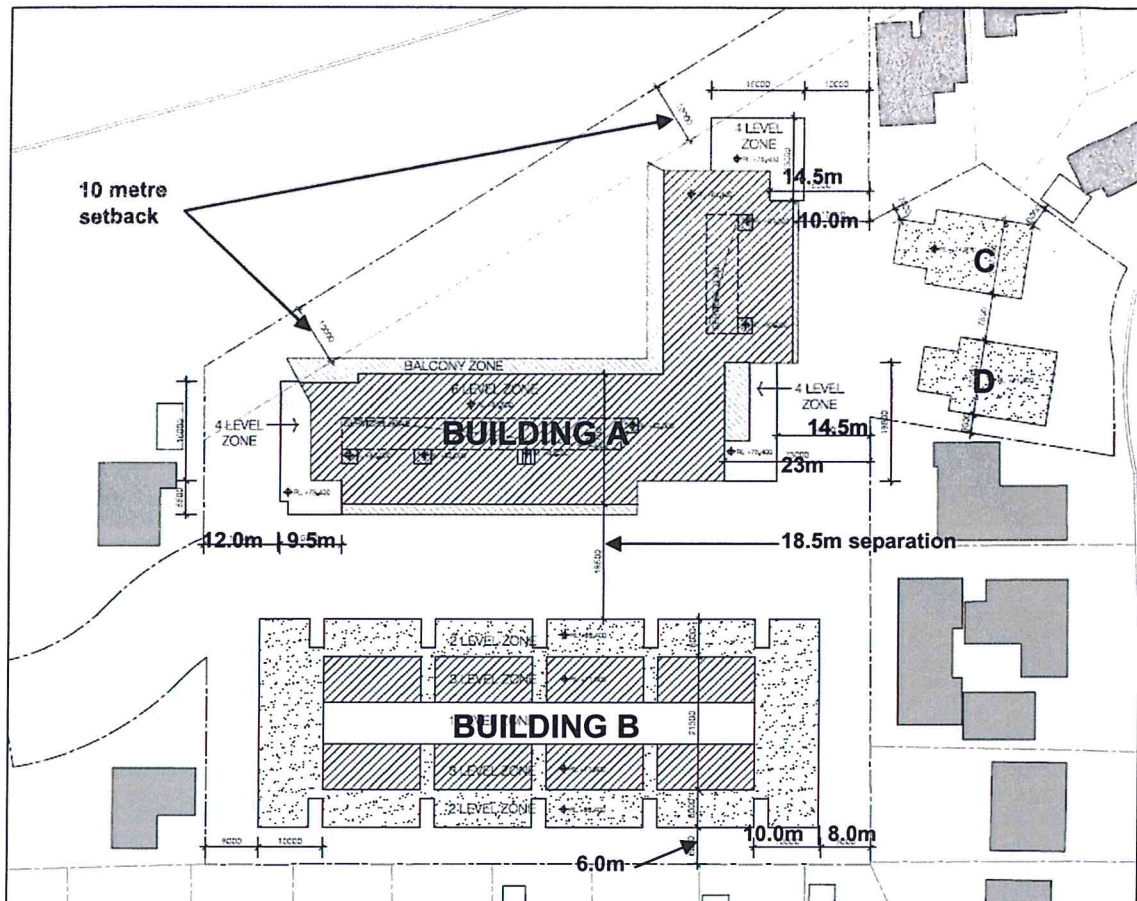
February 2013 Amended Concept Plan- building envelop and site layout plan (source: SJB Architects)
